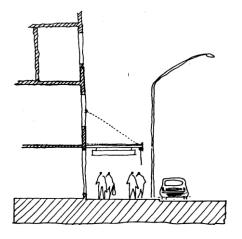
Awning design – suspended steel box section type with a minimum soffit height of 3.2m
